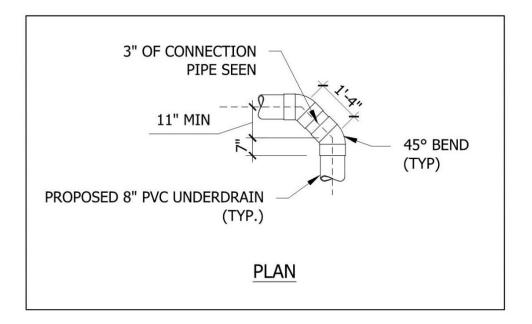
Typical 90° Degree Horizontal Bend - 8" PVC Pipe
